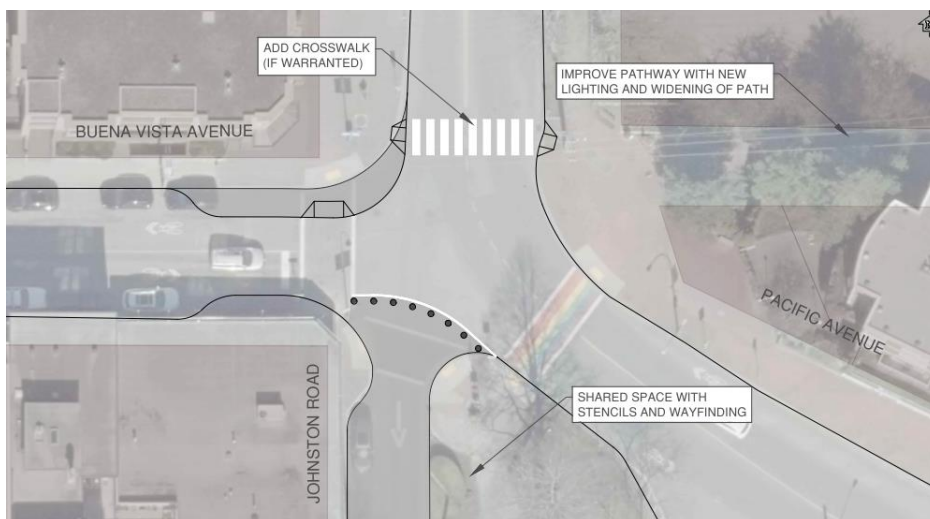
Johnston Road, Pacific Avenue, and Buena Vista Avenue Illustrative Concept
